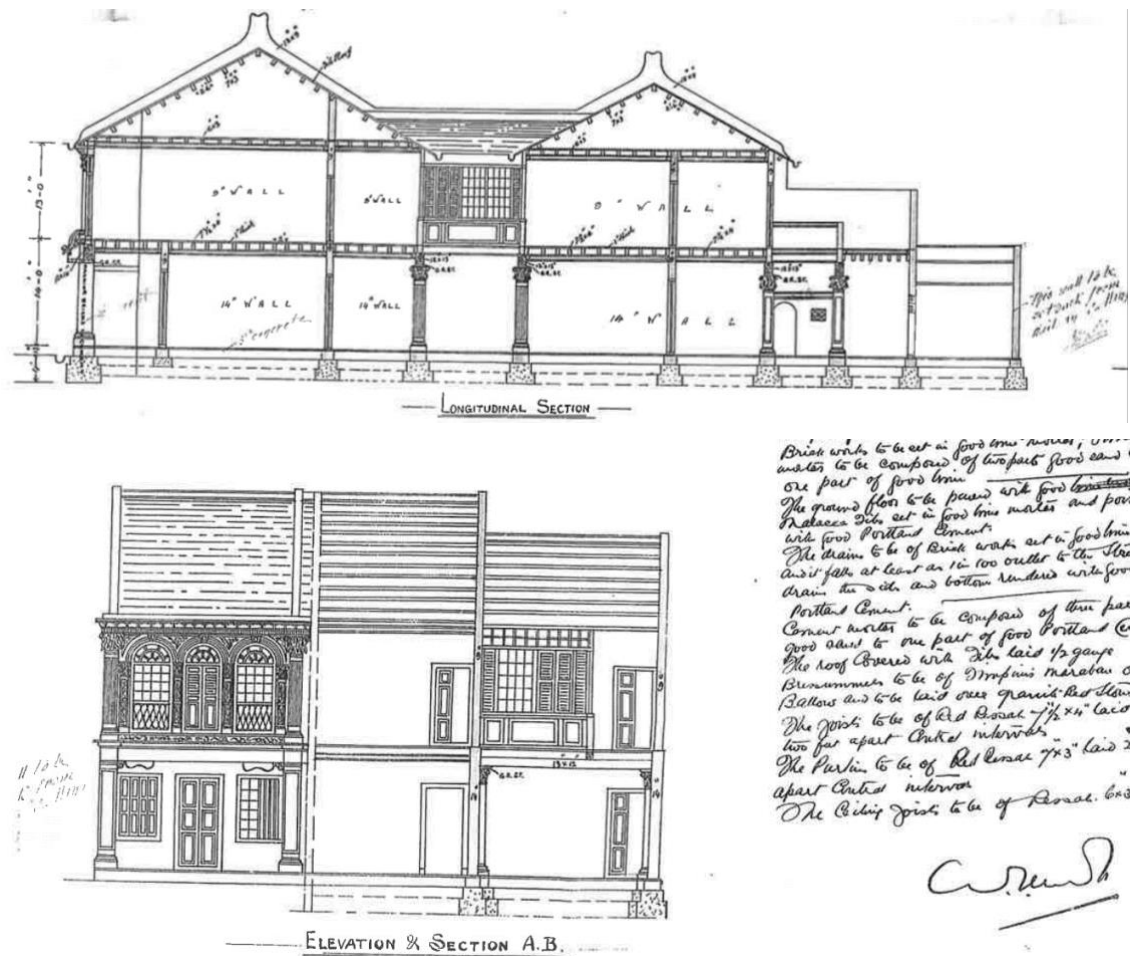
W.T. Moh. Elevation and section for three shophouses at Emerald Hill Road, Singapore, 1889. NAS CBS 121, Building Plan 6439.
